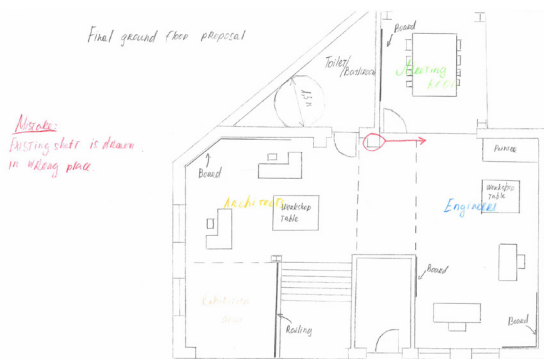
Sketch layout of the ground floor, with furniture and changes to be made
